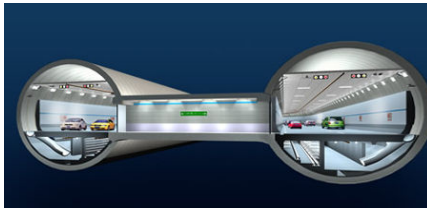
Cross-sectional view of Wuhan Yangtze River Tunnel
